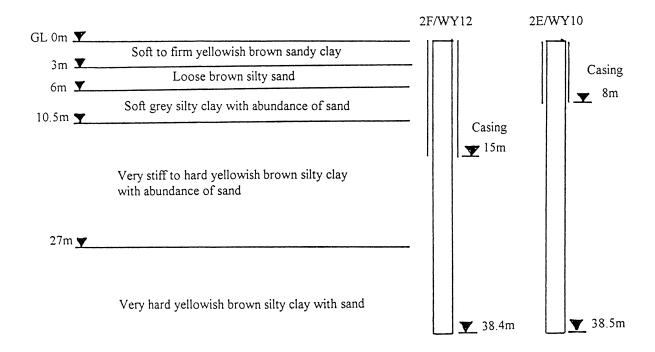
Details of test piles 2F/WY12 and 2E/WY10.
